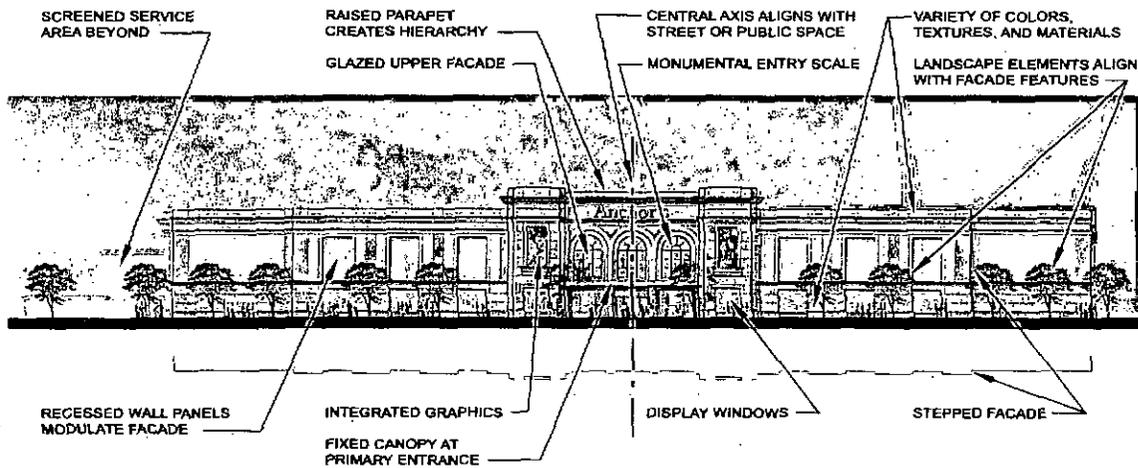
Department Store Façade Example (Combination of Mercantile Street and Cross Street Frontage)
